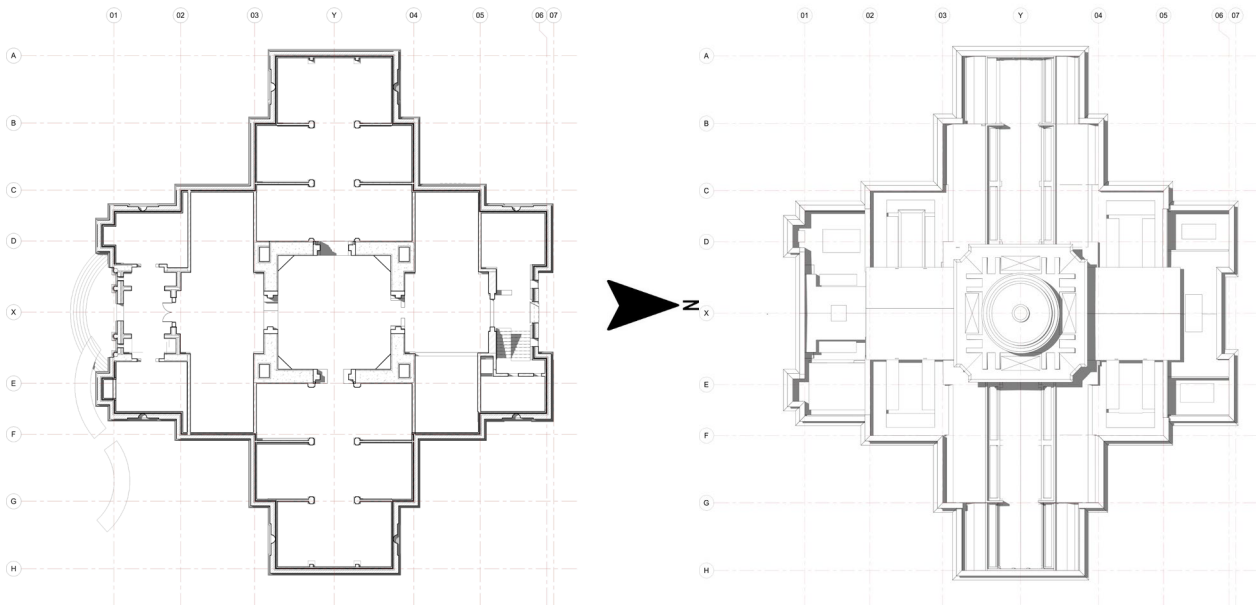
Sarjeant gallery floor plan and roof plan (reproduced from original drawings)
